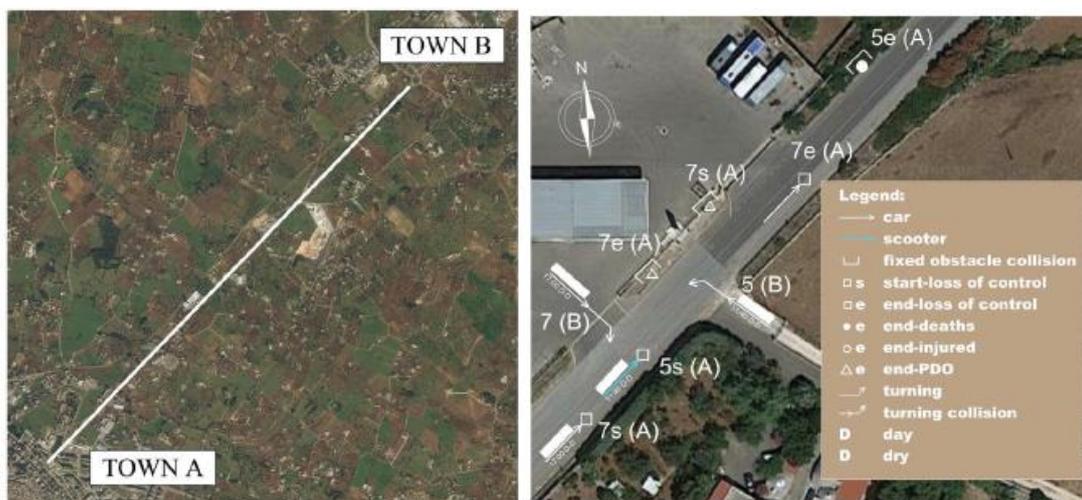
Horizontal alignment and collision diagram of the example road segment characterized by many accesses and minor intersections (Colonna et al., 2018⁵).
